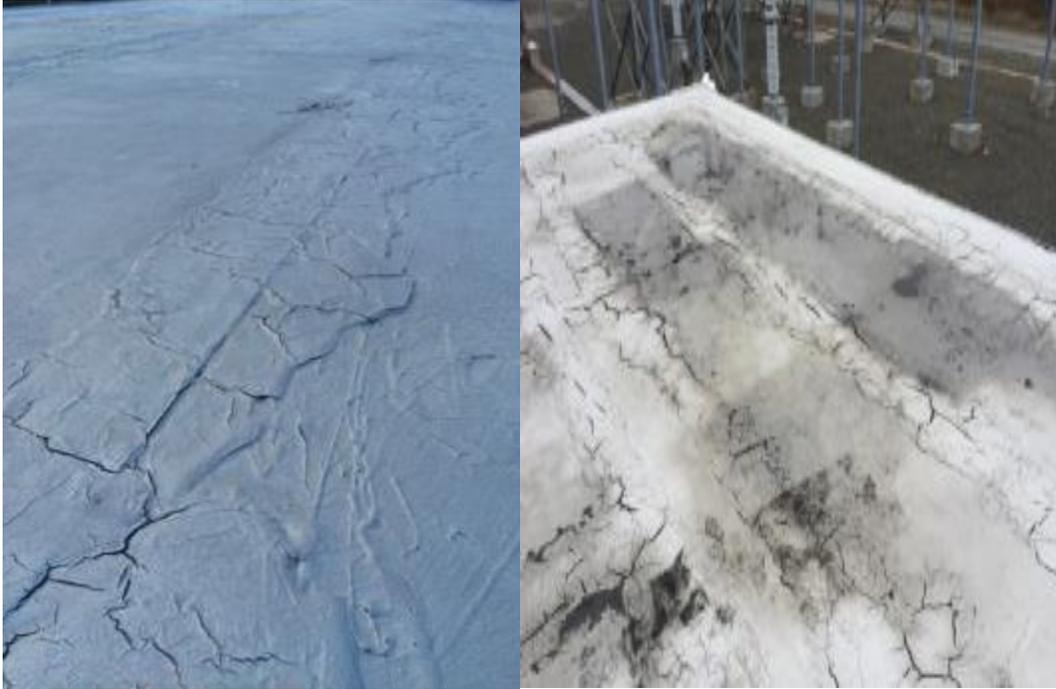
Terminal Station Control Buildings (Come By Chance and Sunnyside) showing cracking and deterioration of the roof membrane systems.
